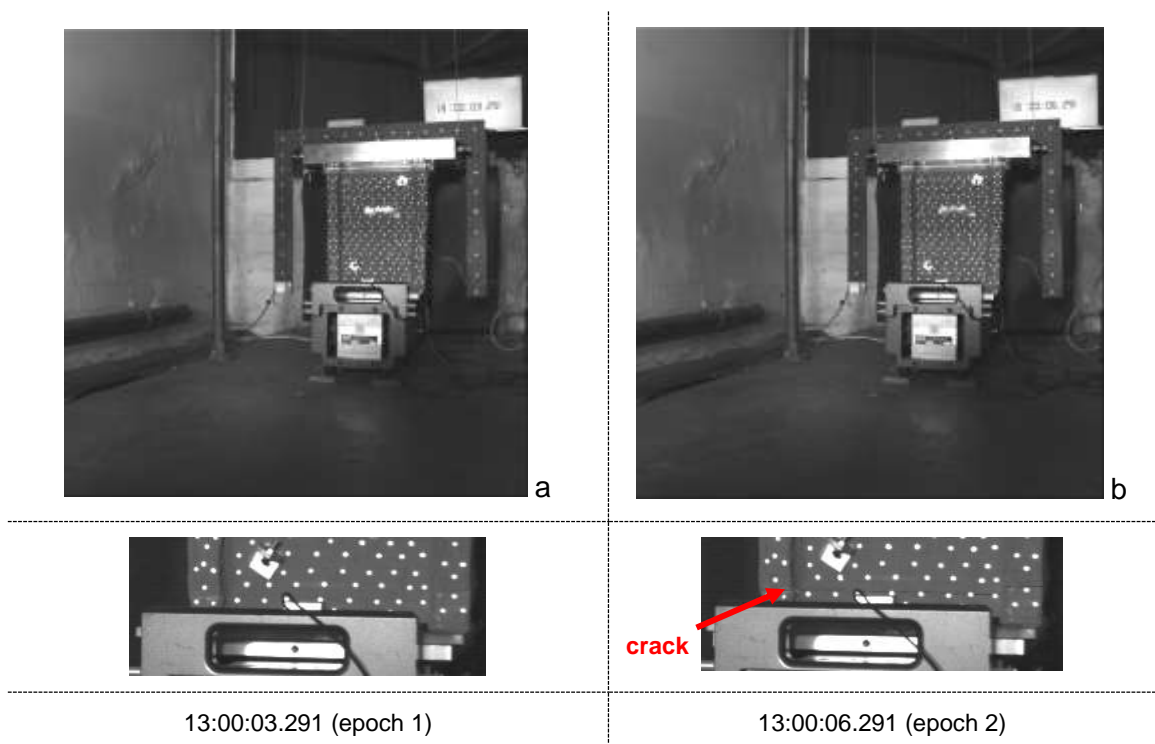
undamaged small-scale masonry specimen – exp 6
